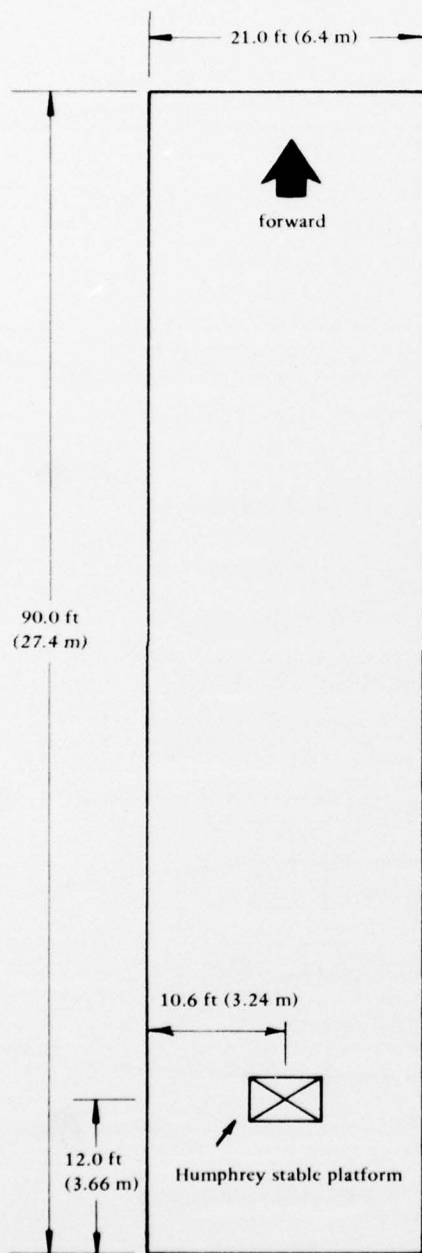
Humphrey stable platform location on midcauseway section for runs 19 and 20.
